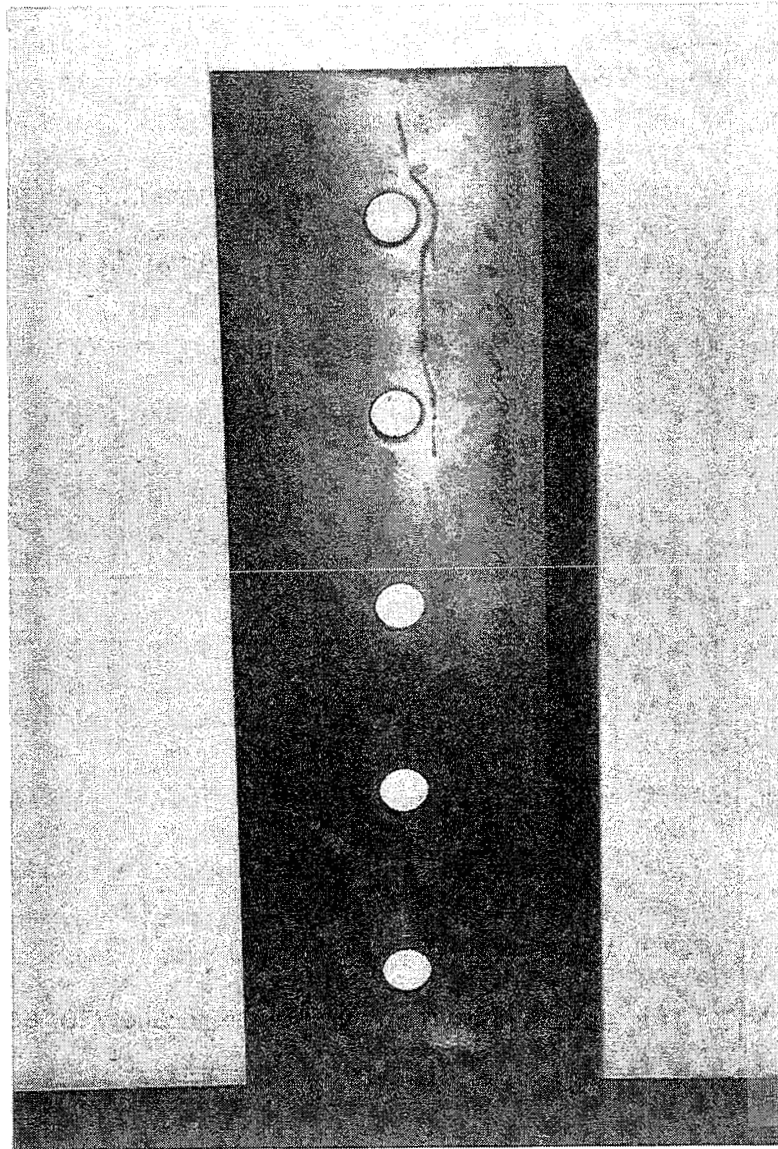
Fatigue Crack in Type D Connection Angle
